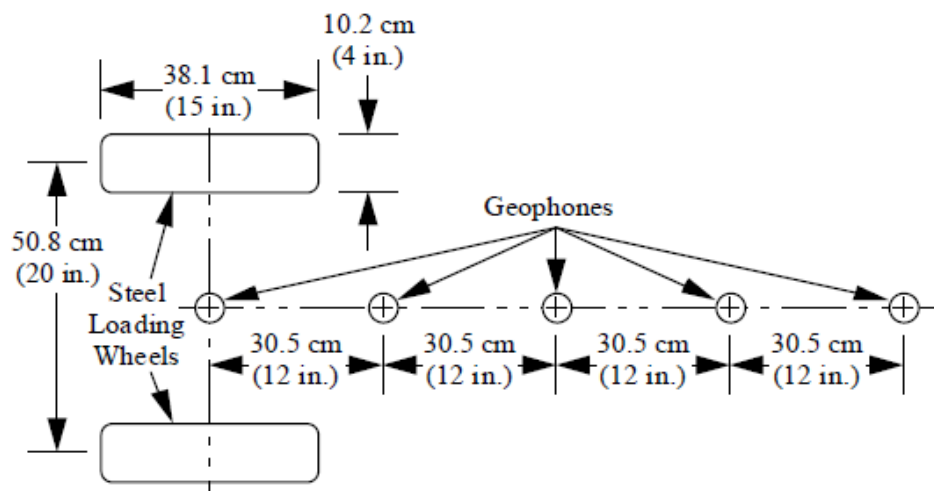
6 Plan view of typical loading wheel/geophone arrangement for Dynaflect
